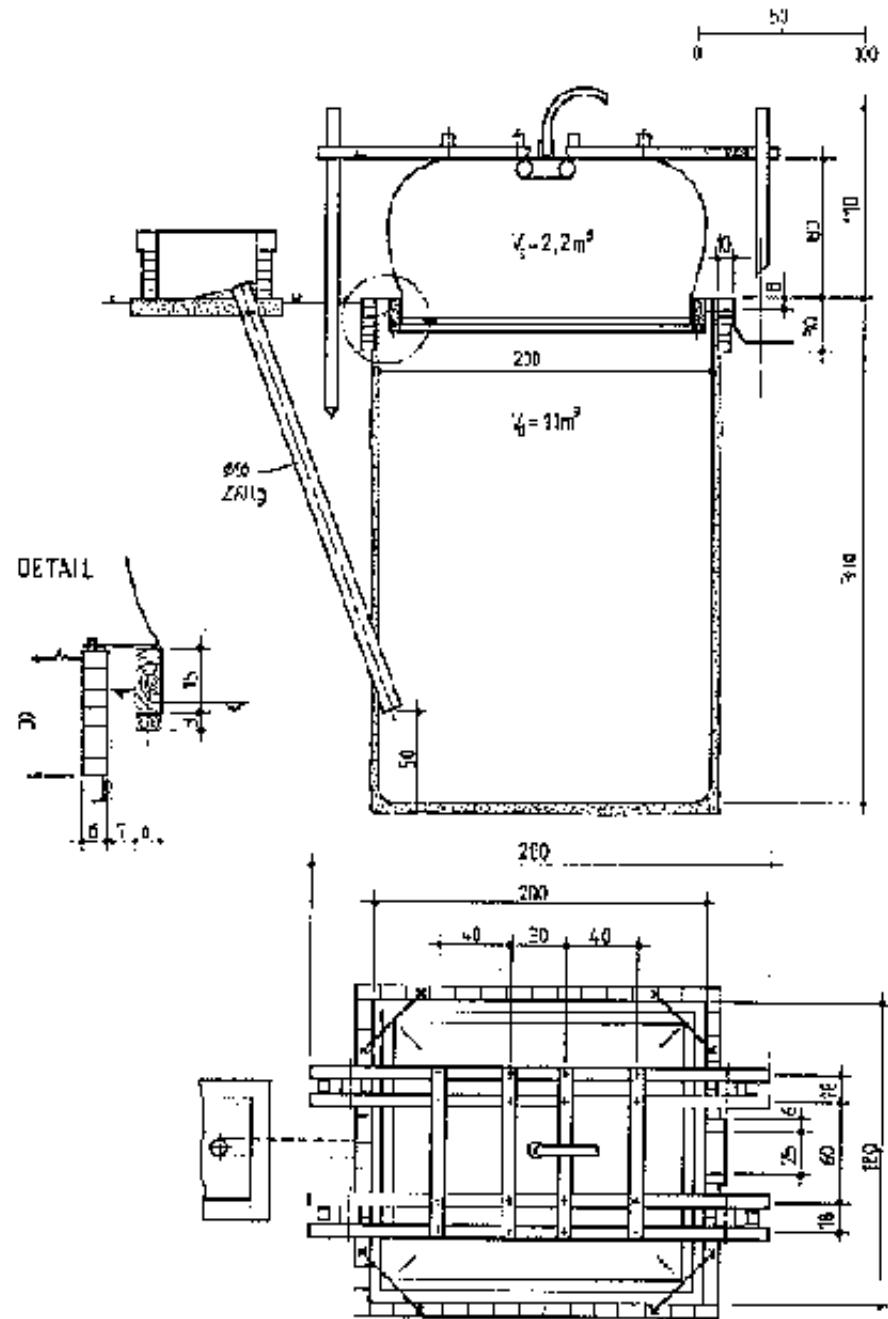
Constructional drawing of an earth-pit biogas plant with plastic-sheet
